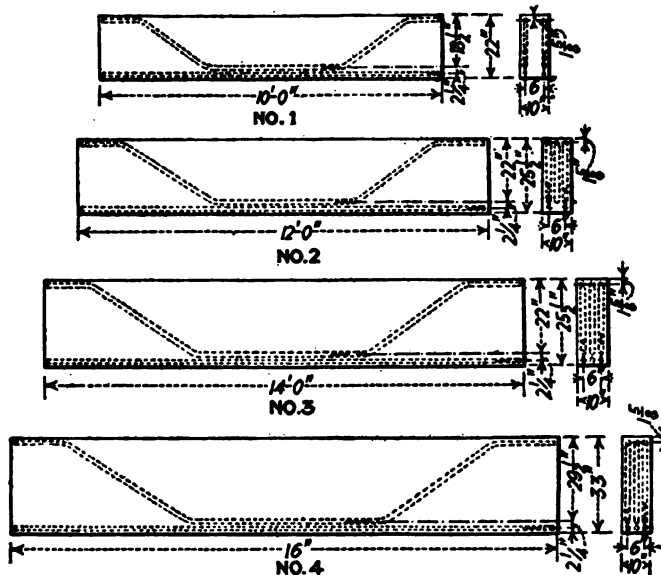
Reinforced concrete caps. (Eng. and Mining Journal.)
